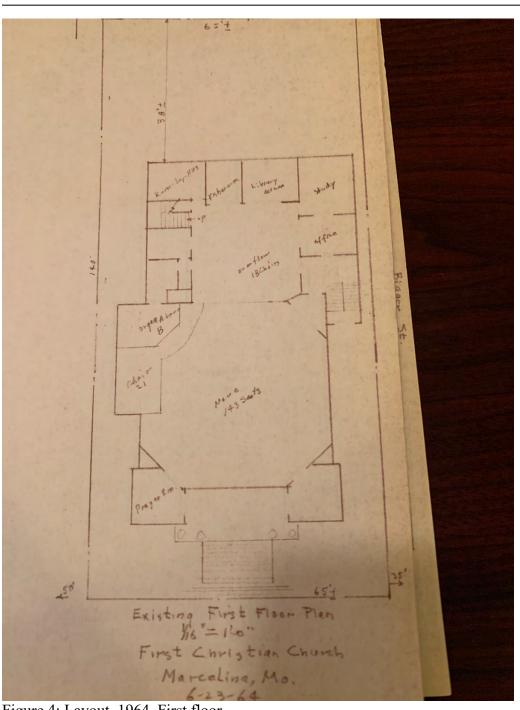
Layout, 1964, First floor Existing First Floor Plan 1/16" = 1' 0" First Christian Church Marceline, MO. 6-23-64
